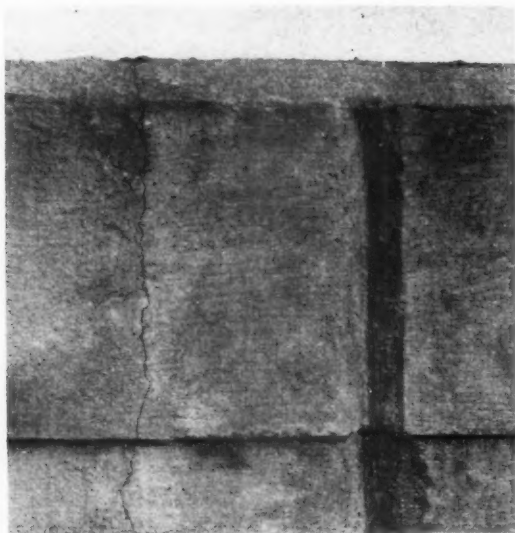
A construction joint occurring only a few inches away from a deliberate dummy joint in a parapet wall.
